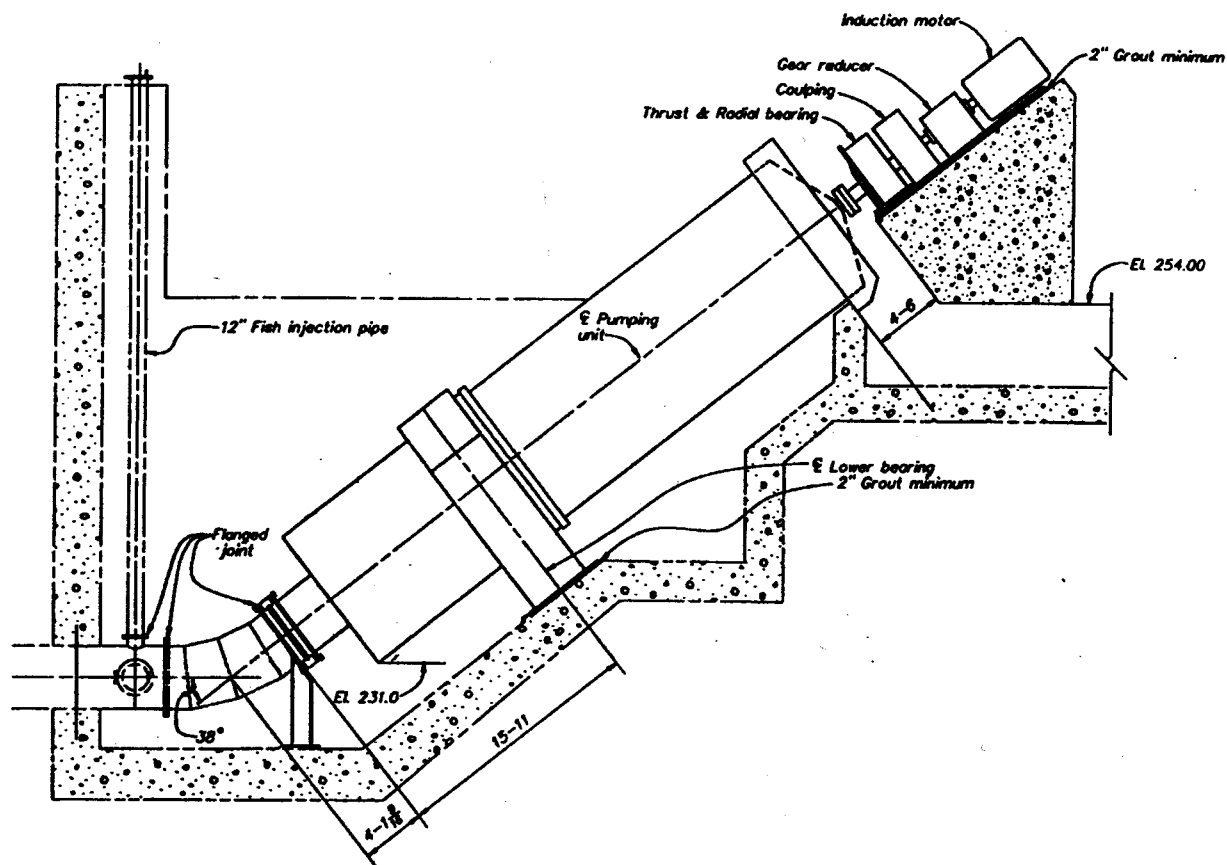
Sealed inlet Archimedes Installation. Red Bluff Research Pumping Plant installation. Note sealed inlet condition with rotating seal.
